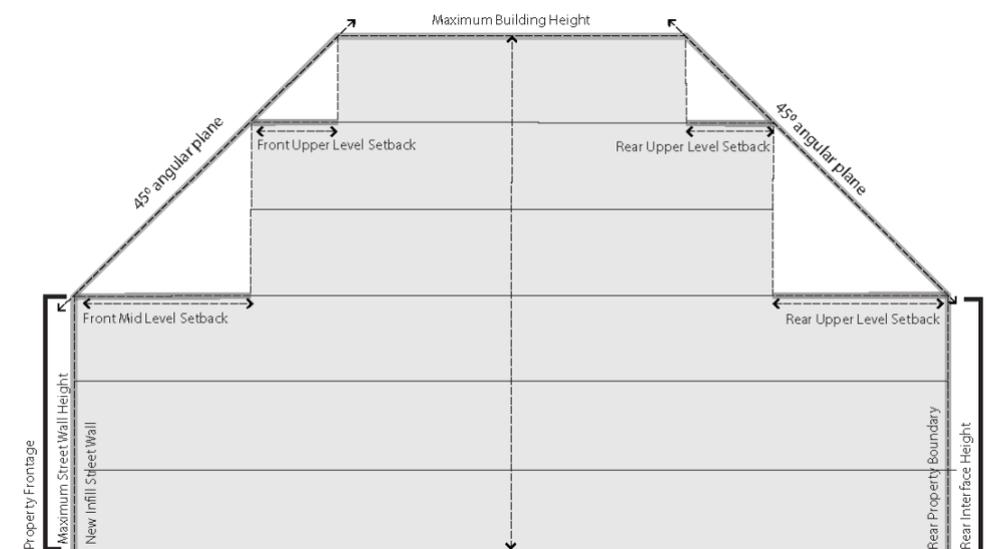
Building envelope requirement – Heritage Building (Figure 1 in Schedule 15 to Clause 43.02 Design and Development Overlay).
